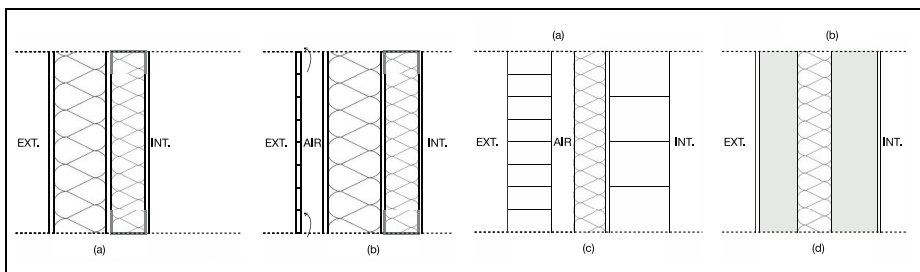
Representative static opaque facade typologies: (a) Lightweight off-site wall, (b) Lightweight/medium-weight ventilated wall, (c) Medium-weight/heavyweight cavity wall, and (d) Heavyweight exposed concrete wall with a white painting finishing: this is the Static Performance Reference for the analysed case studies.
